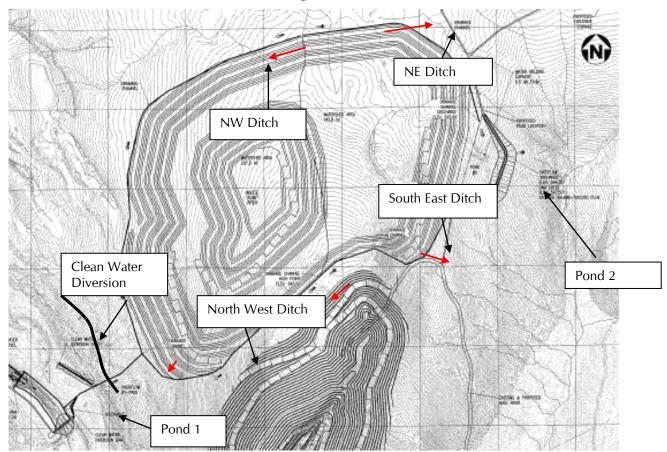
Stormwater Management System Layout - Waste Dump Stockpile Area
